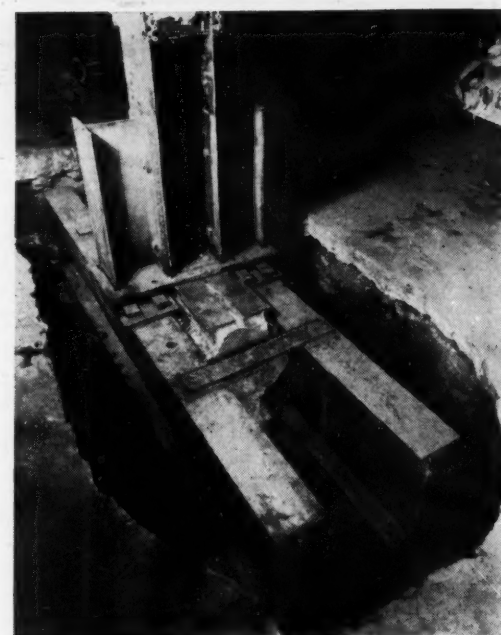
SIX INTERIOR COLUMNS of Building 8 were underpinned with 12-in. Tuba steel cylinders driven by pile hammer, cleaned out with earth auger and filled with concrete.
